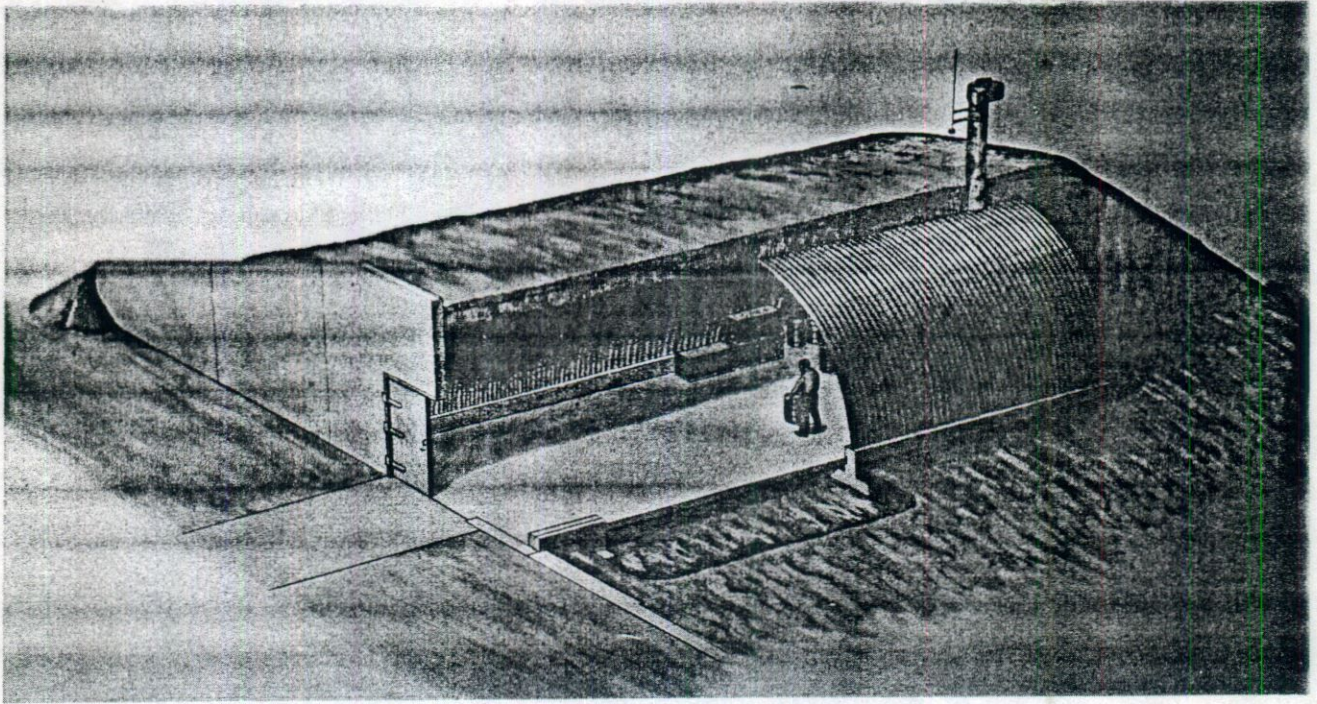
Conventional Storage Igloo; Sectional View Showing Overburden 2 to 3 Feet Deep
